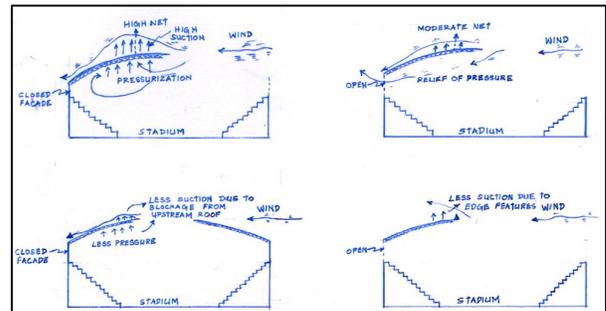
Sketches of wind flow passing cantilevered roof of a stadium.
